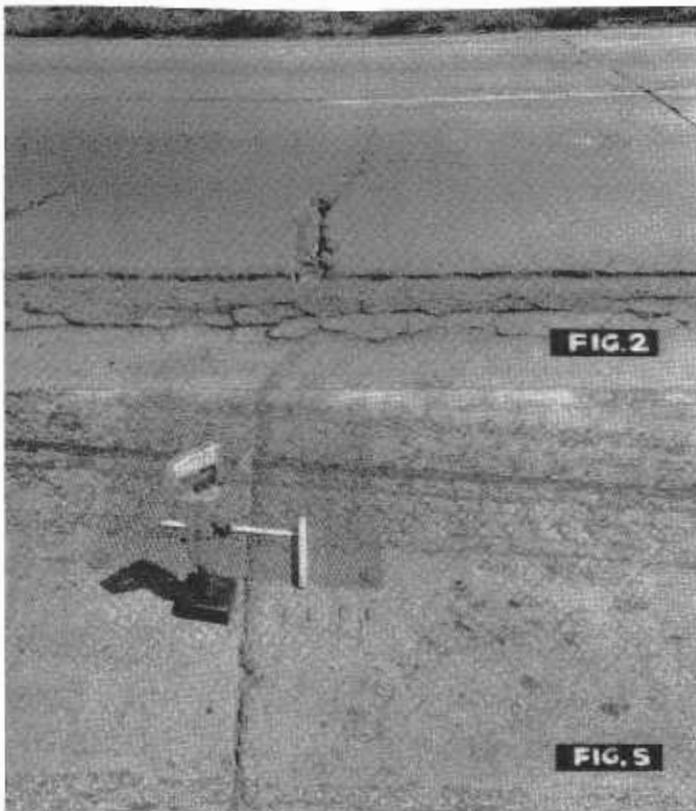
Condition of old concrete pavement random cracks.
